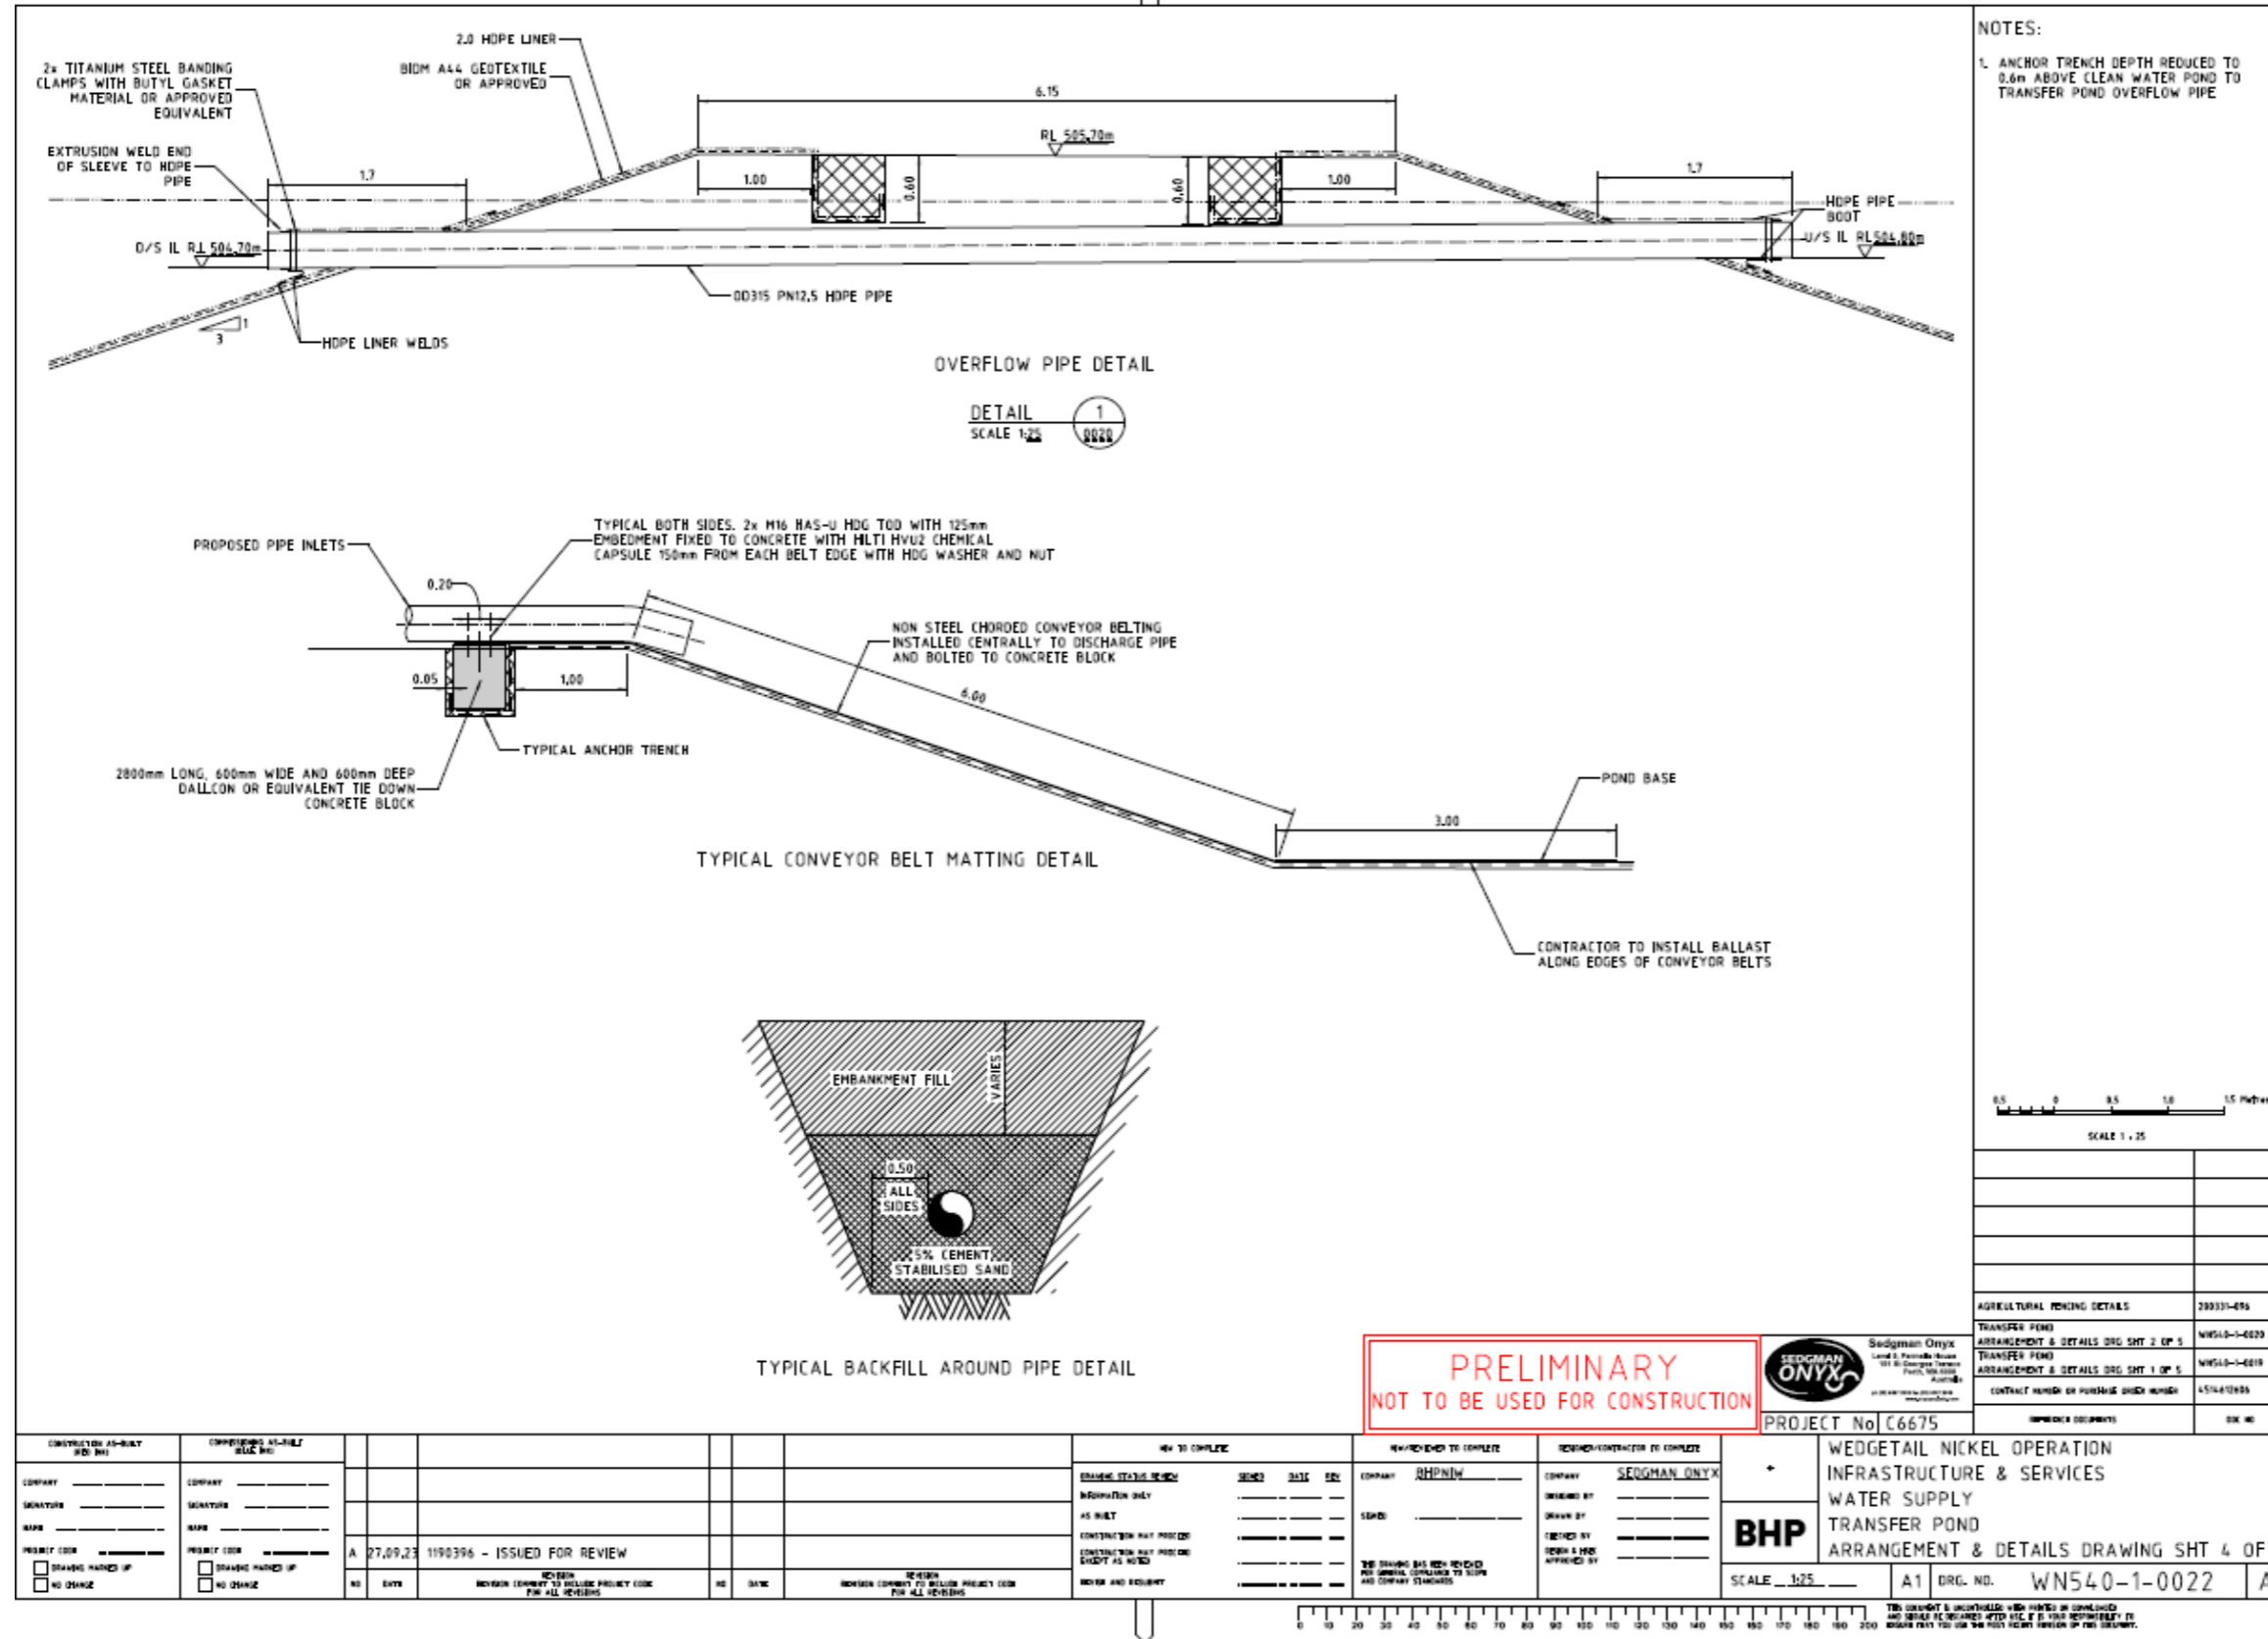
Pond to pond transfer pipe arrangement and detailed drawings
